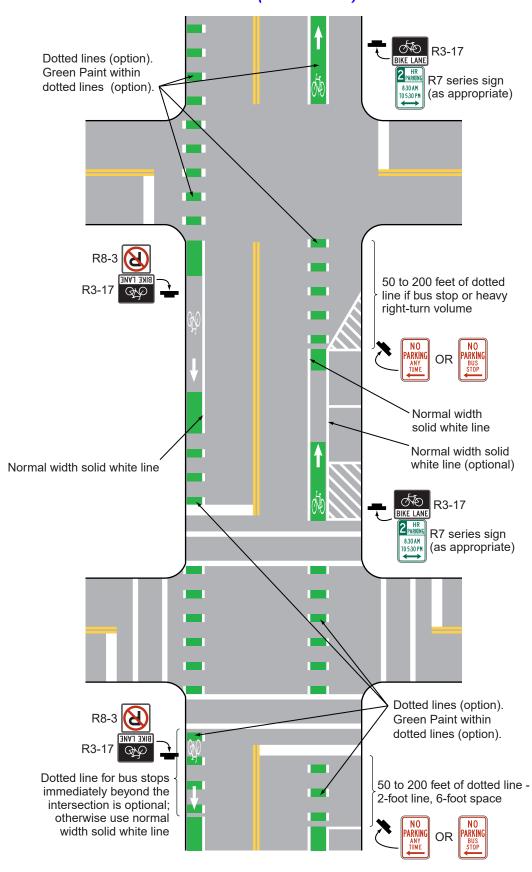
E-3. Examples of Bicycle Lane Markings on an Approach to an Intersection (Sheet 1 of 3)
